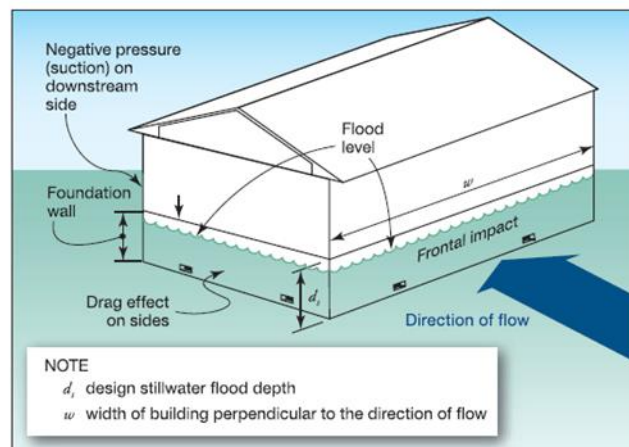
Hydrodynamic loading on a building (source: FEMA, 2011)
